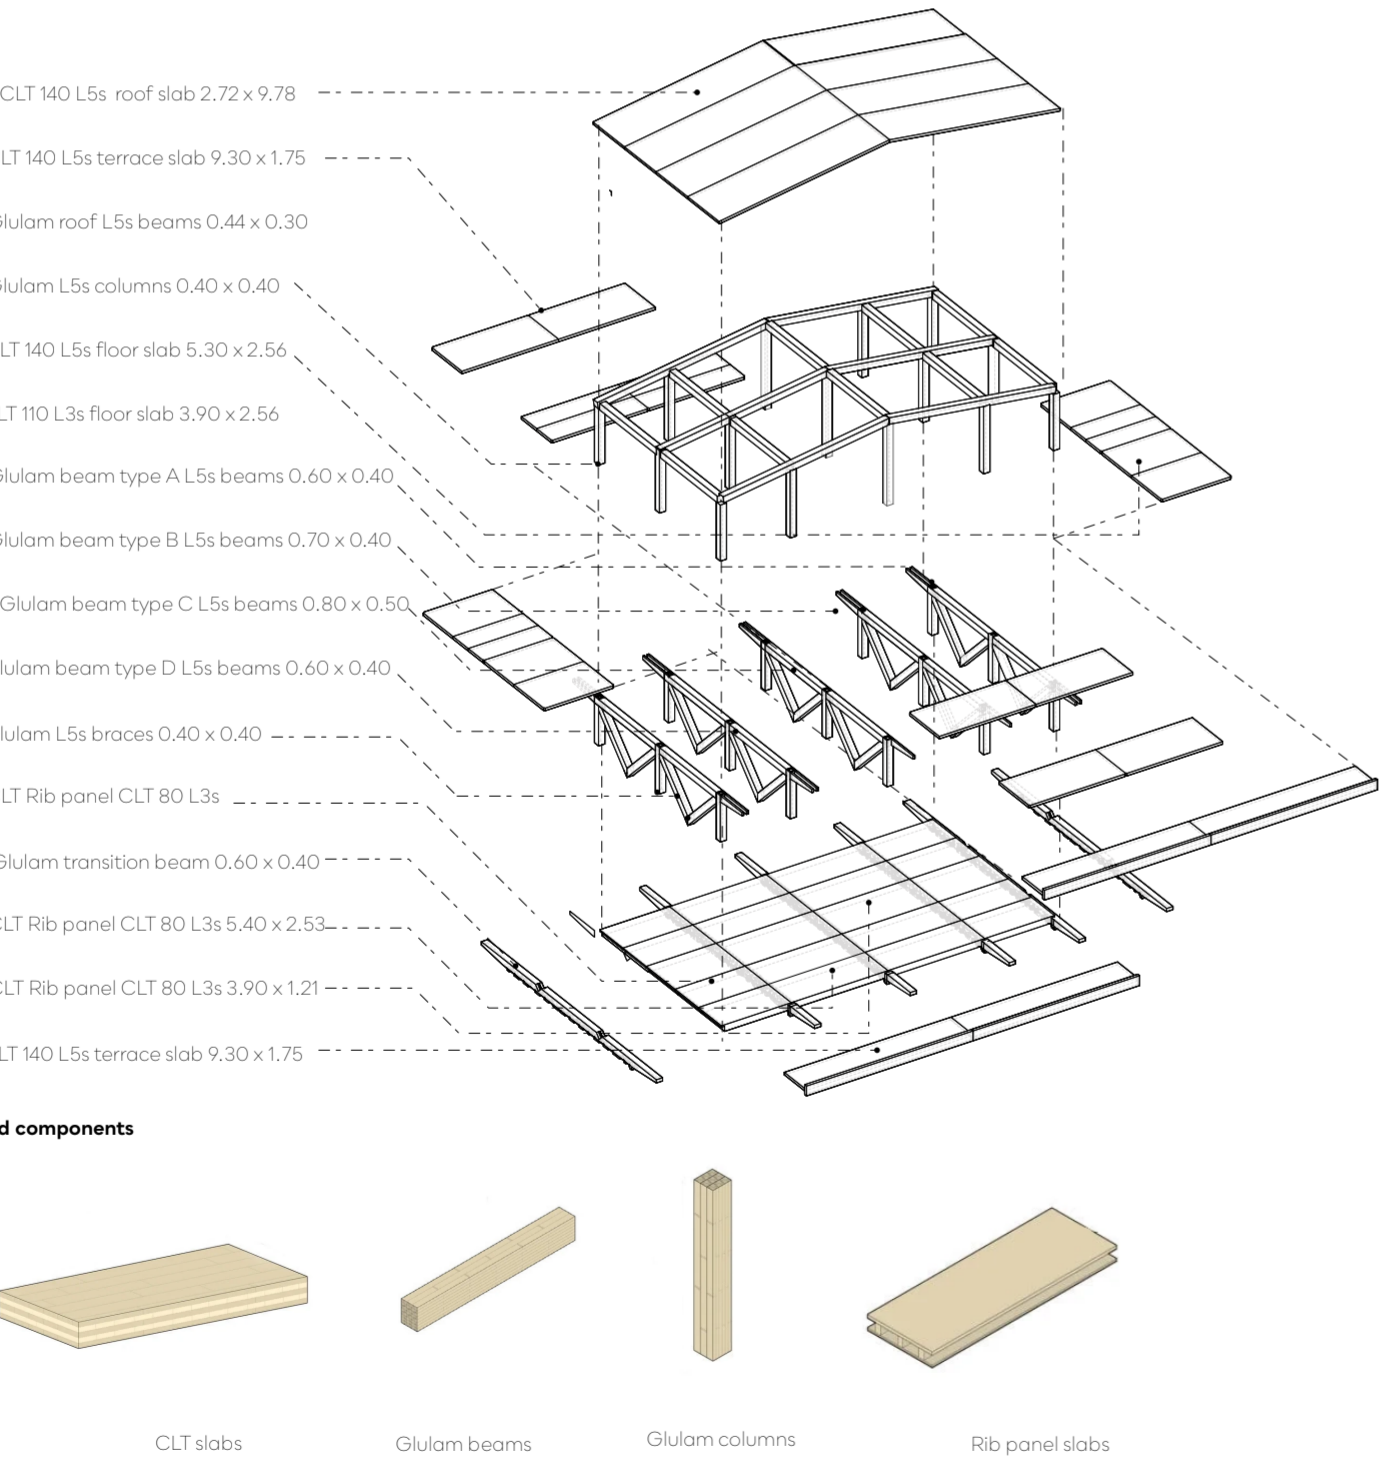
Exploded schematic view of the Timber Top-Up and its components.
